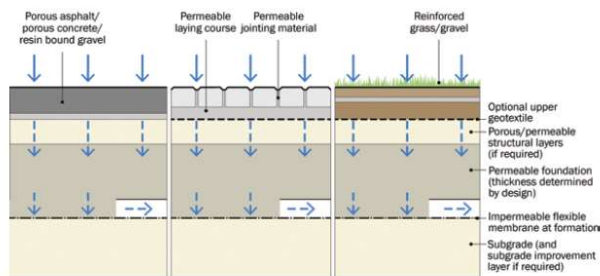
Permeable pavement system types: Type C – no infiltration
